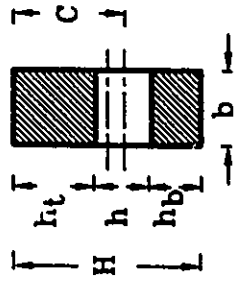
TENSION STIFFENING OF CONCRETE
